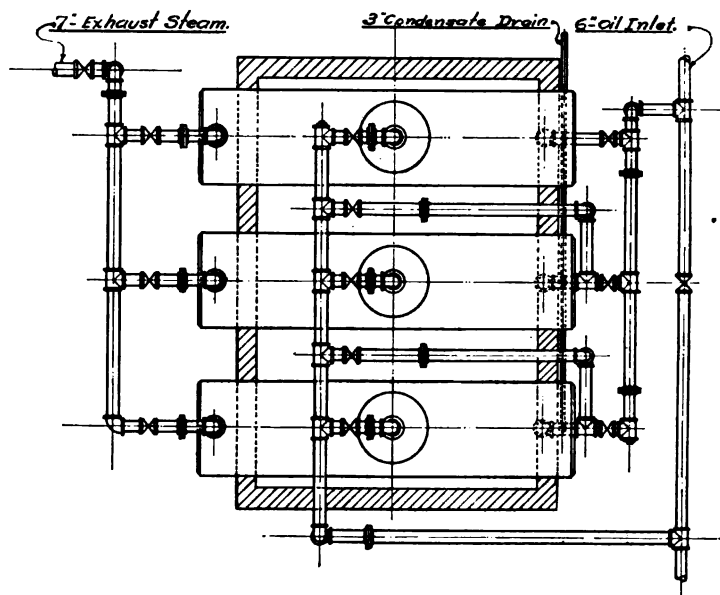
FIRST OIL-HEATING PLANT. PLAN.
